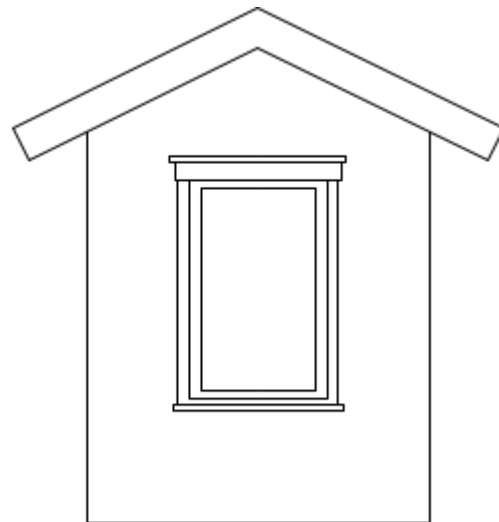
This image shows how building side walls should be treated depending on lot conditions. Buildings that have side walls that are adjacent to publicly accessible space should add detail, glazing or entrances to the side wall to avoid large blank surfaces. Buildings that are adjacent to buildable lots with no side setback may have blank walls in anticipation of future site development.
